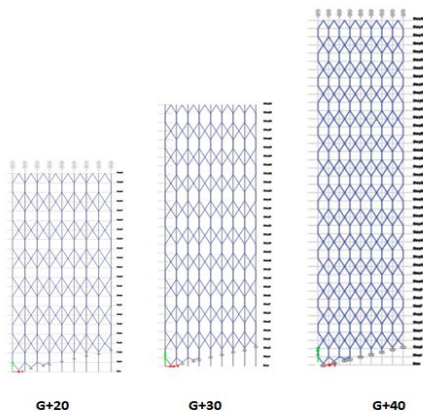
Elevation of Building On Sloping Ground Model Geometry
